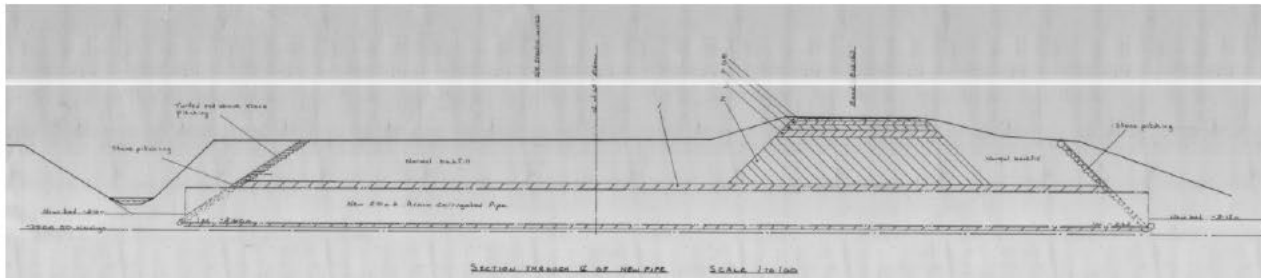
Drawing Lysaghts pumping station scheme B1216 Road Crossing, S.173/27, Scunthorpe Internal Drainage Board, March 1982.
